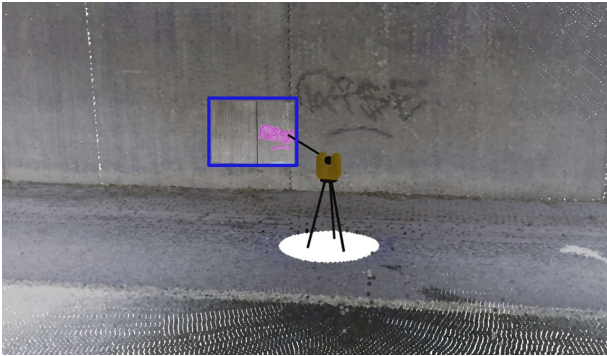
Projection of a defect image of graffiti on the concrete wall below Bridge A.
